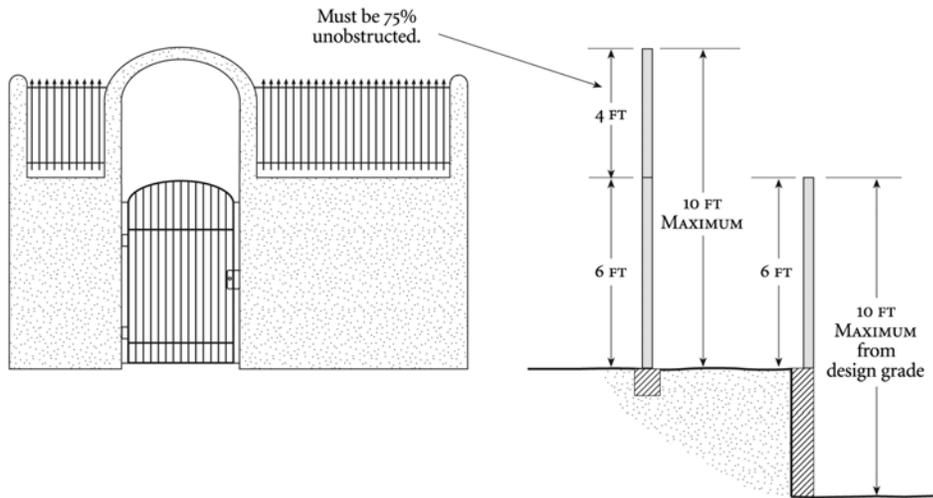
A: Height of Wall or Fence within a Side or Rear Perimeter Yard
